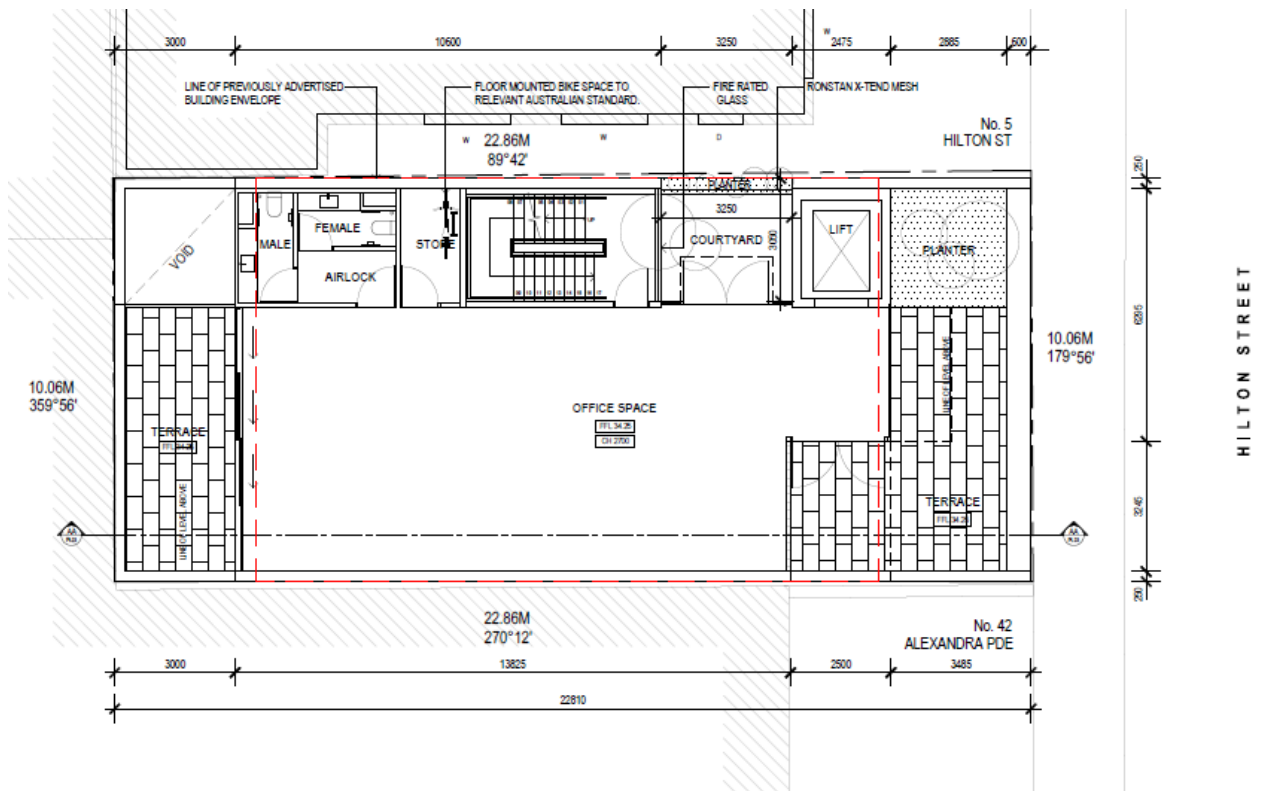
Example of increased front setback shown to third floor plan of the sketch plans (the previous footprint is shown in red)
